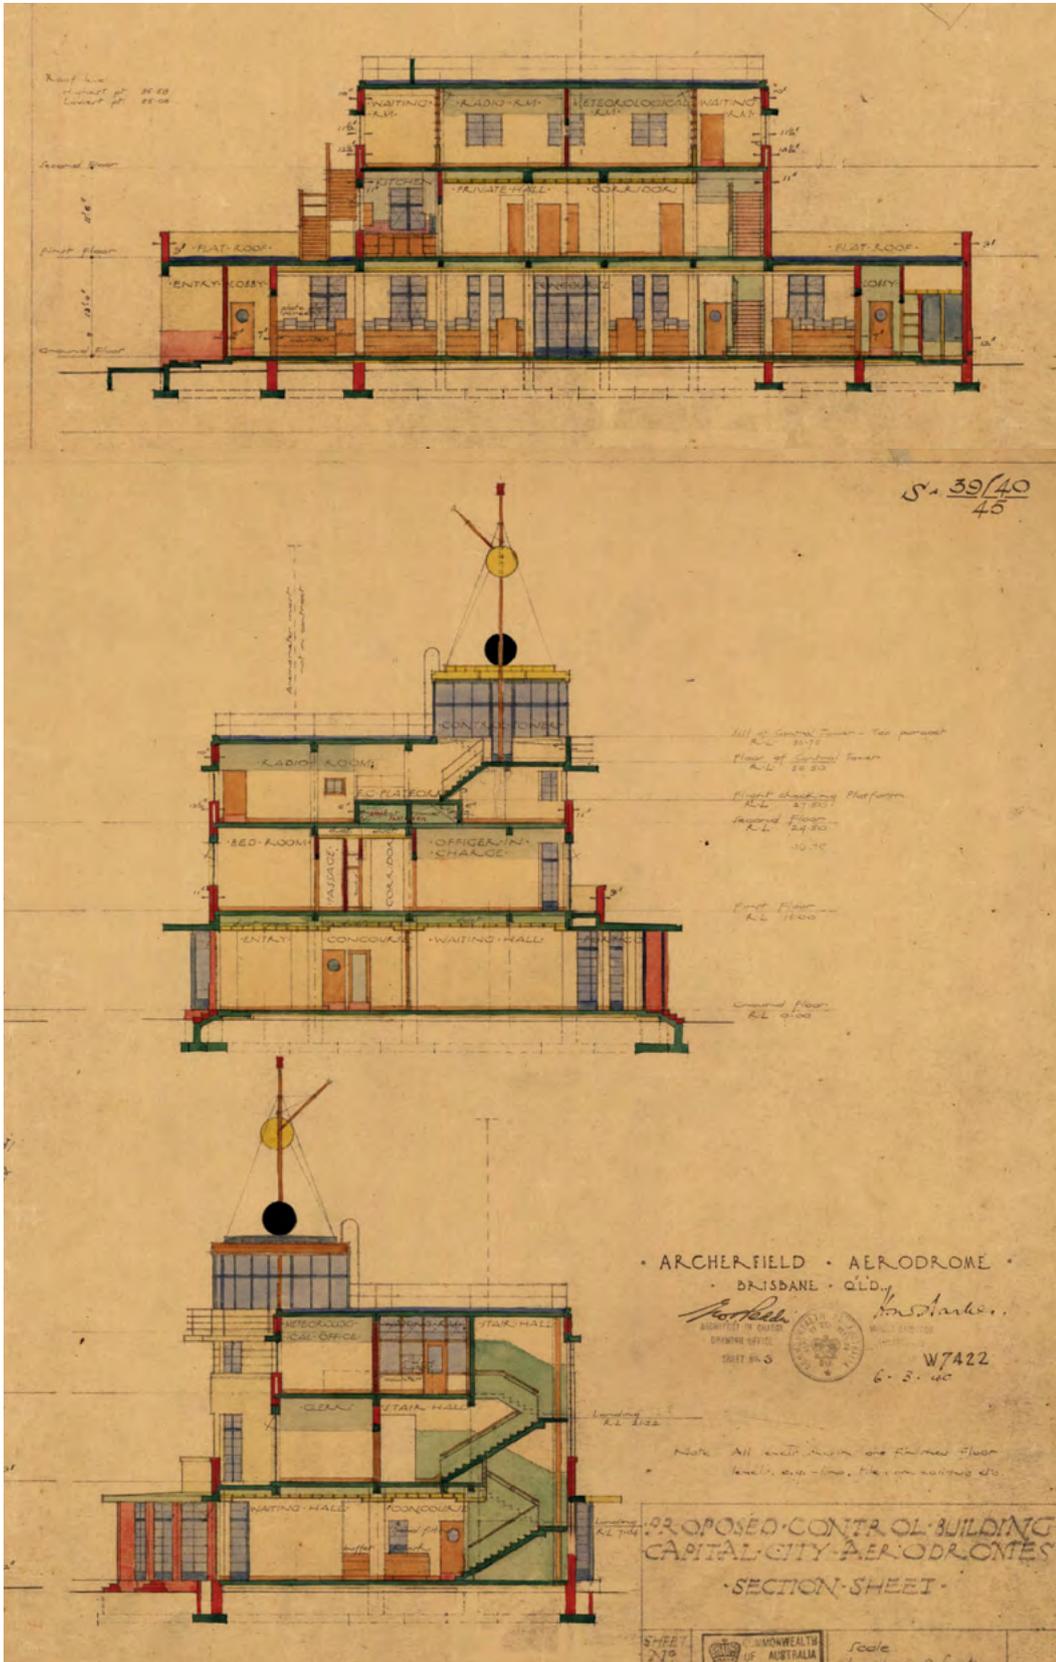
Elevations of Archerfield (Queensland) Ops & Admin building, 1939
